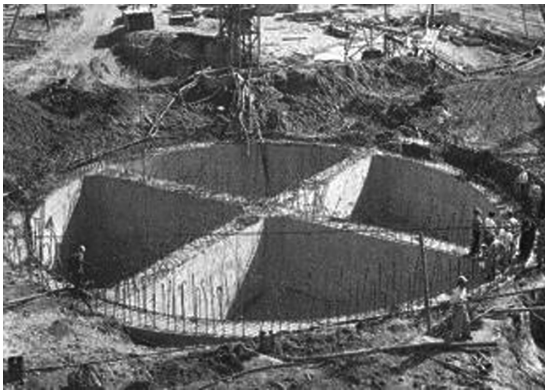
Sunk-well foundation for blast furnace in Kukioka
